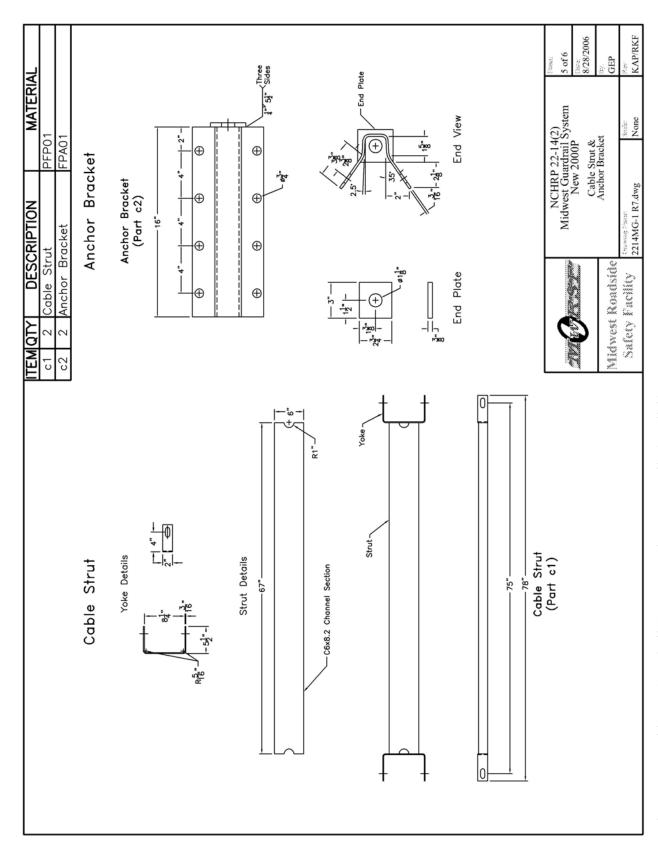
Midwest Guardrail System Anchorage Details (English)
